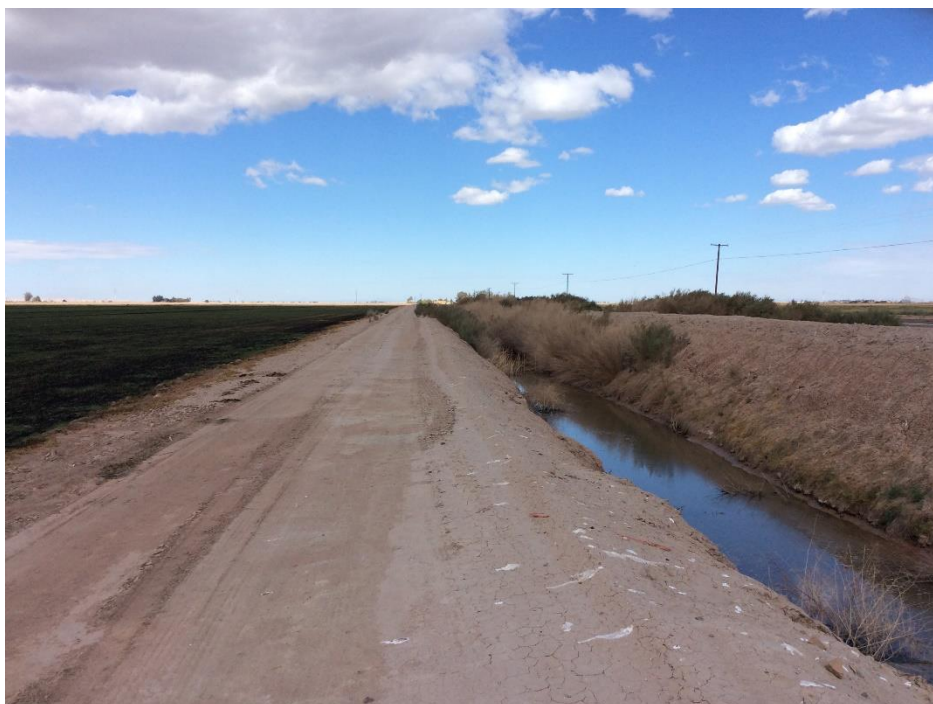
DS-I-9– Overview of drain looking north, 2/22/18 (IMG_0327)).
